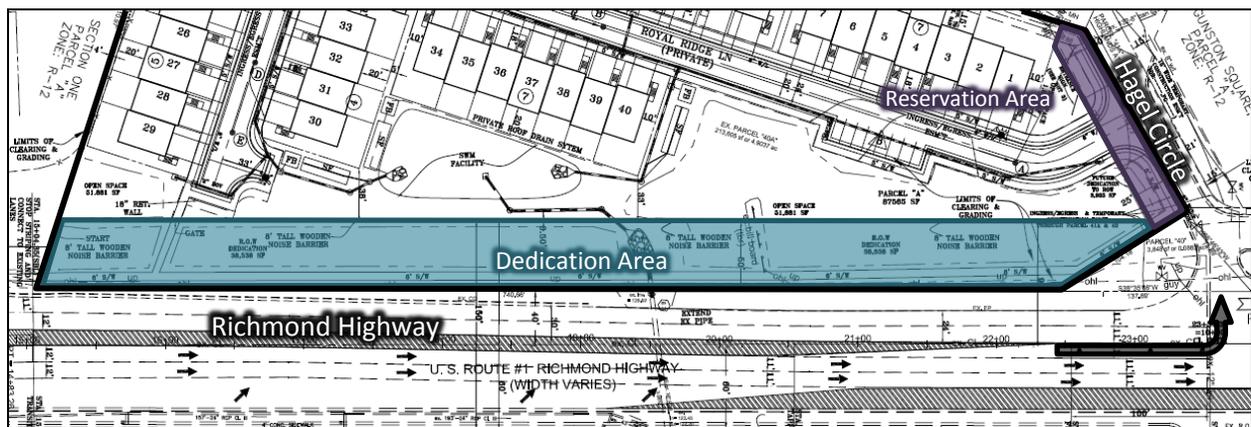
Sheet 2 of the GDP identifies the acreage to be dedicated for public street purposes, the acreage reserved upon demand for future right-of-way, and the proposed left turn lane from northbound Richmond Highway (Source: Soil and Structure Consulting, Inc., 10/8/2014)
